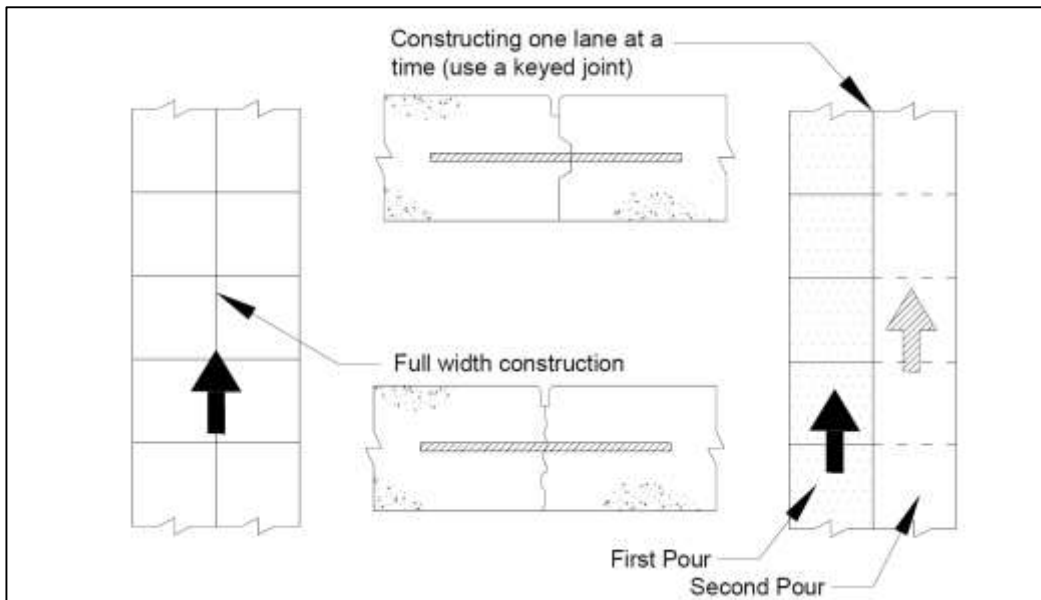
Construction of longitudinal joints (Perrie, 2000)
